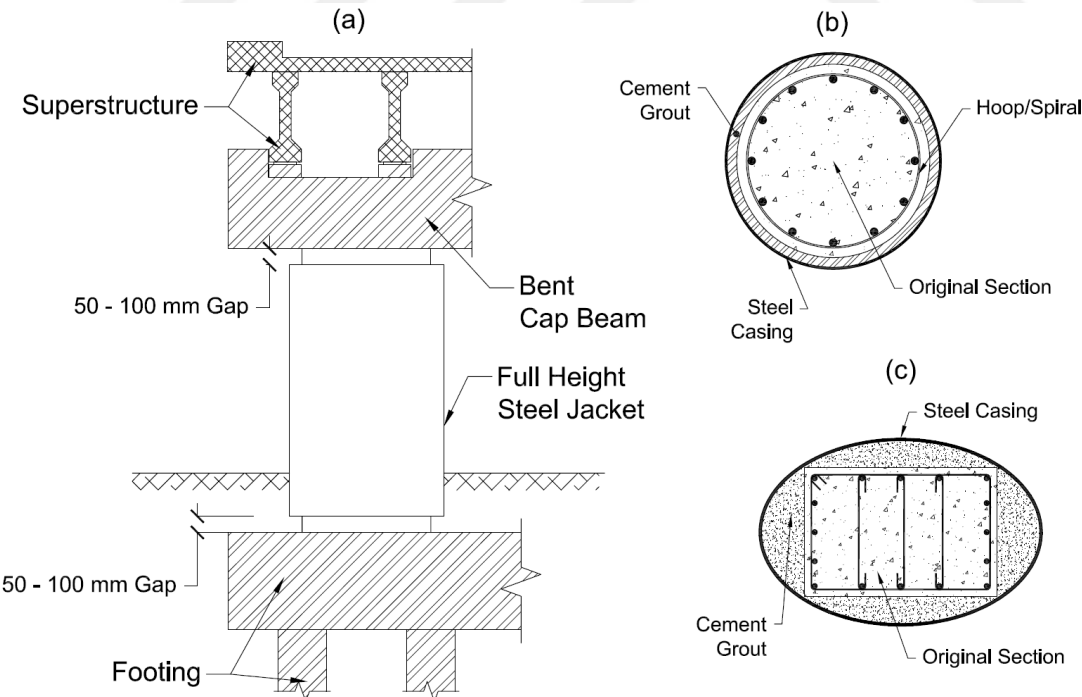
a) Retrofitted bridge column by full height steel jacketing technique b) Circular steel jacketing of a circular column c) Elliptical steel jacketing of a rectangular column.
